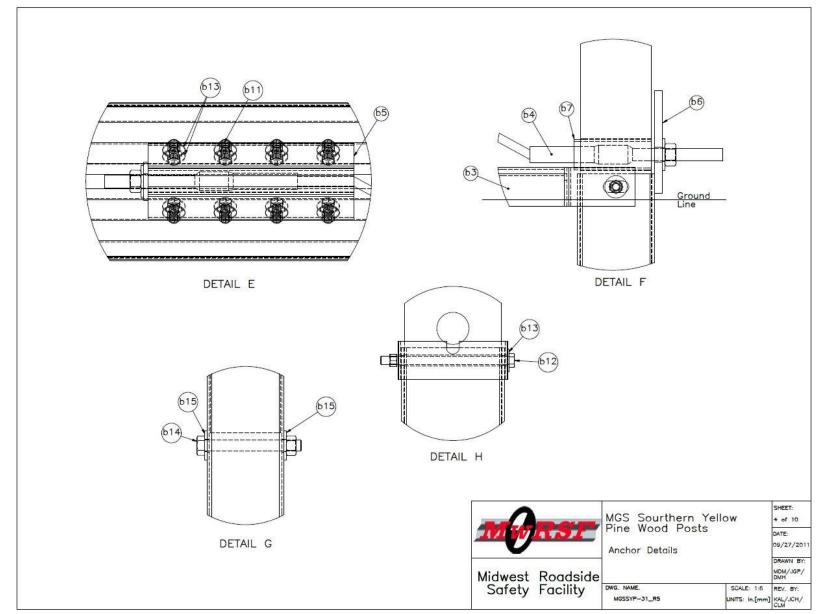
Anchorage Component Details, Test No. MGSSYP-1
